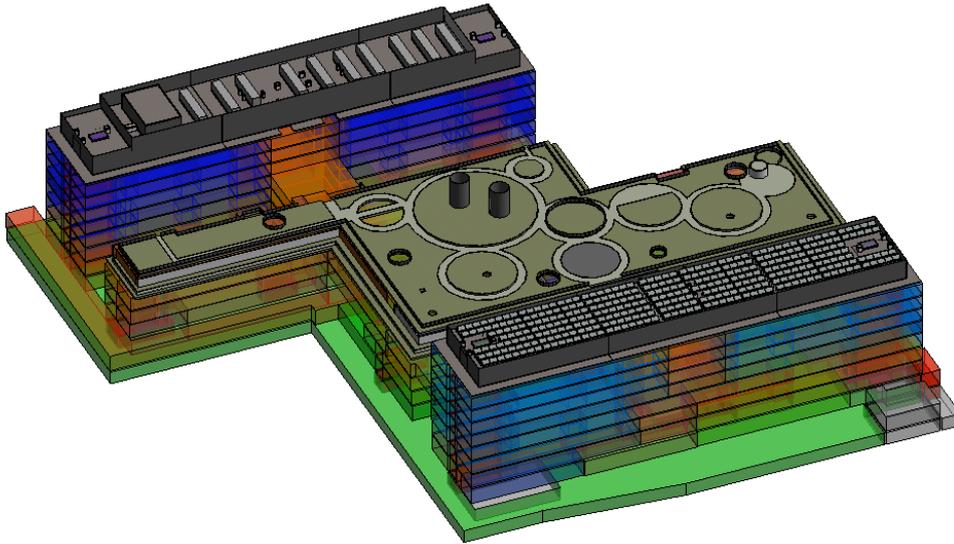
Size and shape of the proposed hospital building (Source: WeBuild S.p.A.)
